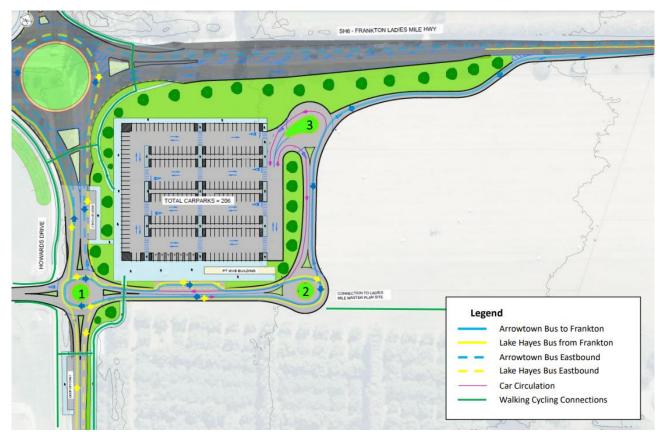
Concept plan for Park and Ride facility at Ladies Mile (Source: Queenstown Lakes District Council - Ladies Mile).
